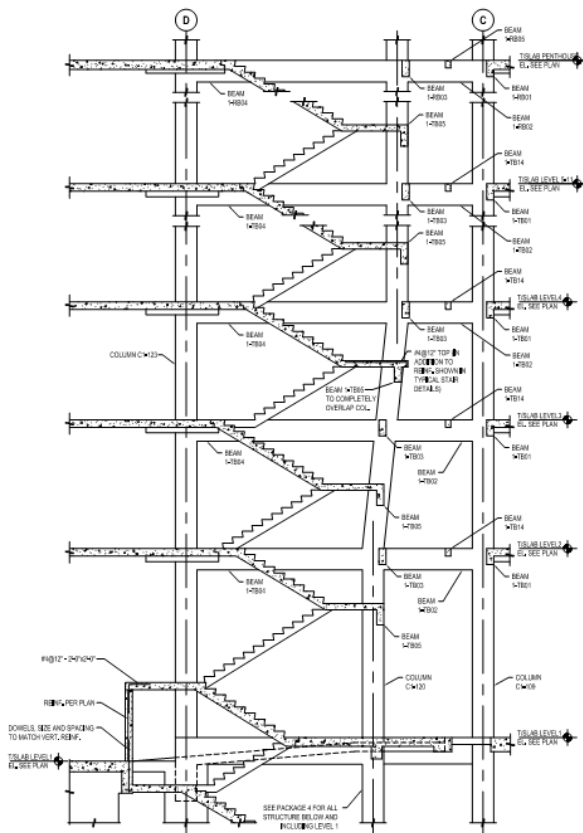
A typical stair section that shows the columns and beams that support the stairs.
